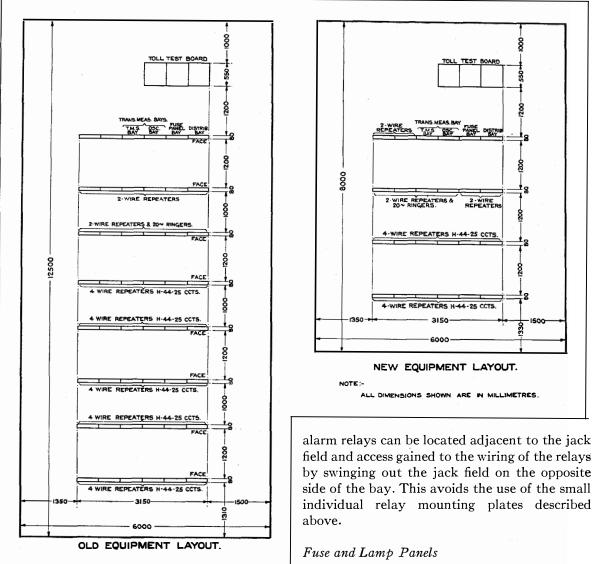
Specimen Floor Plans Comparing Old and New Equipments
